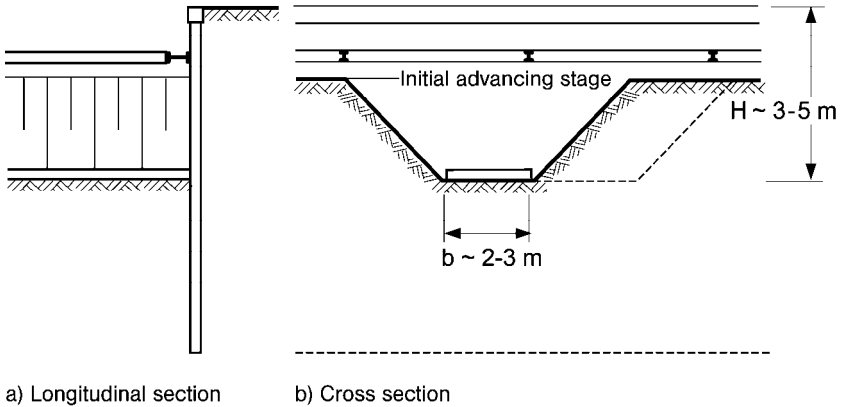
Single-propped retaining wall in soft soil after installing the first strip of blinding concrete
